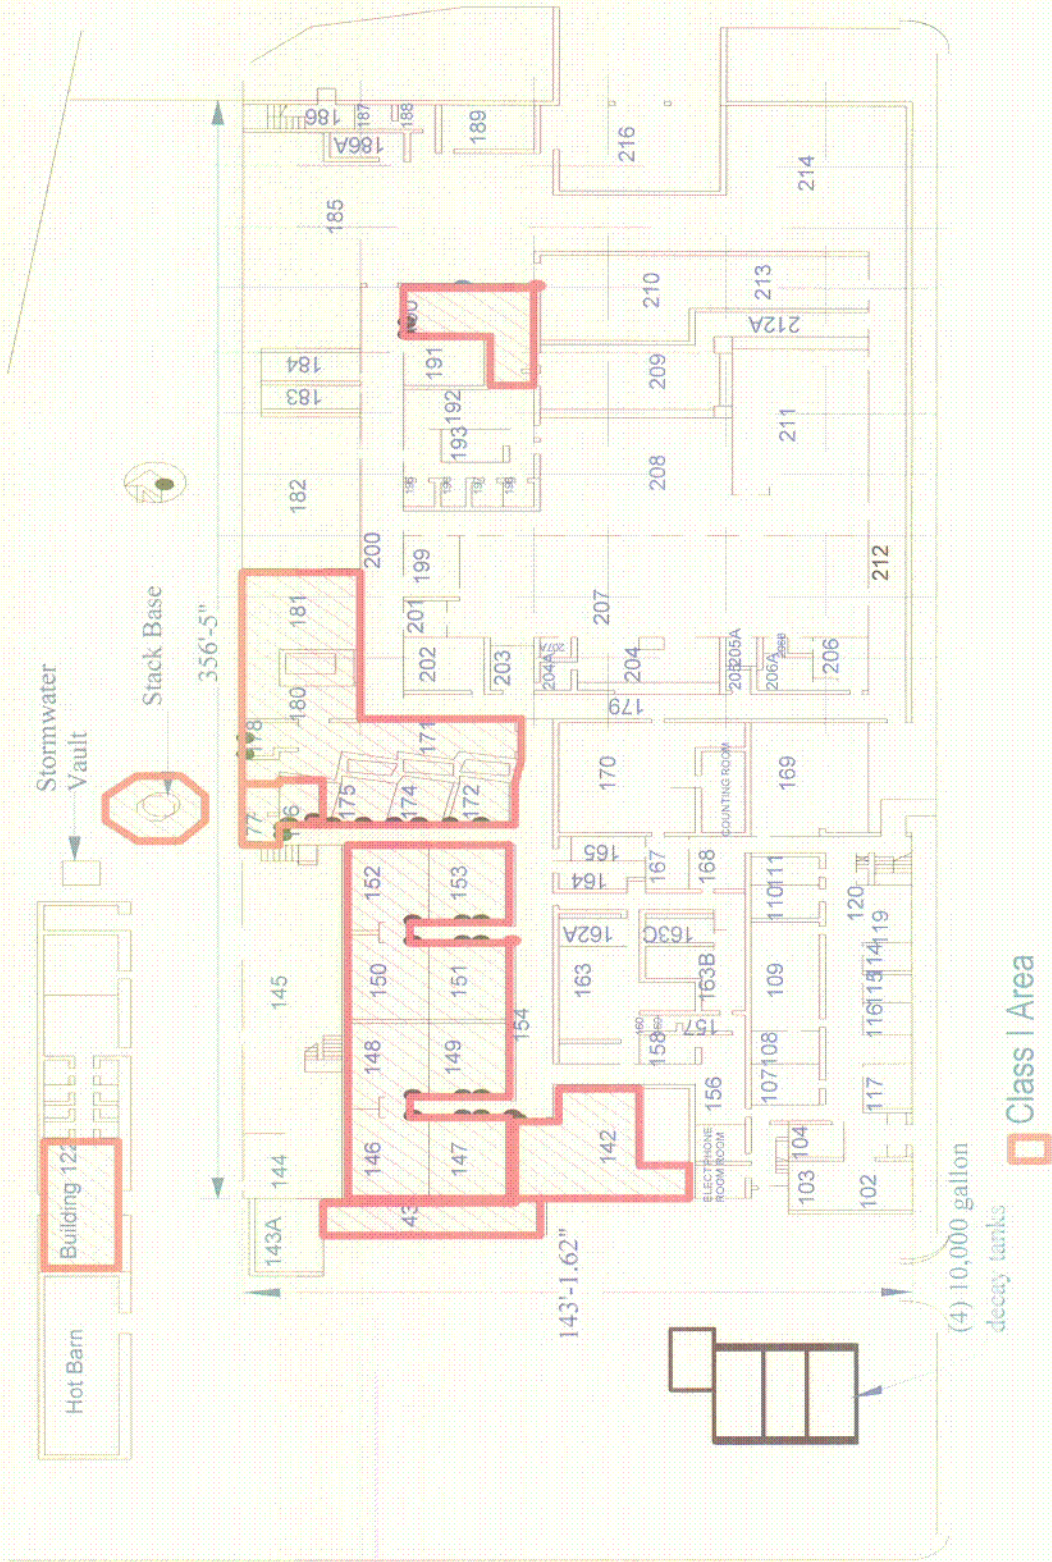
BMS Building 122 and 124 First Floor Class 1 Areas
